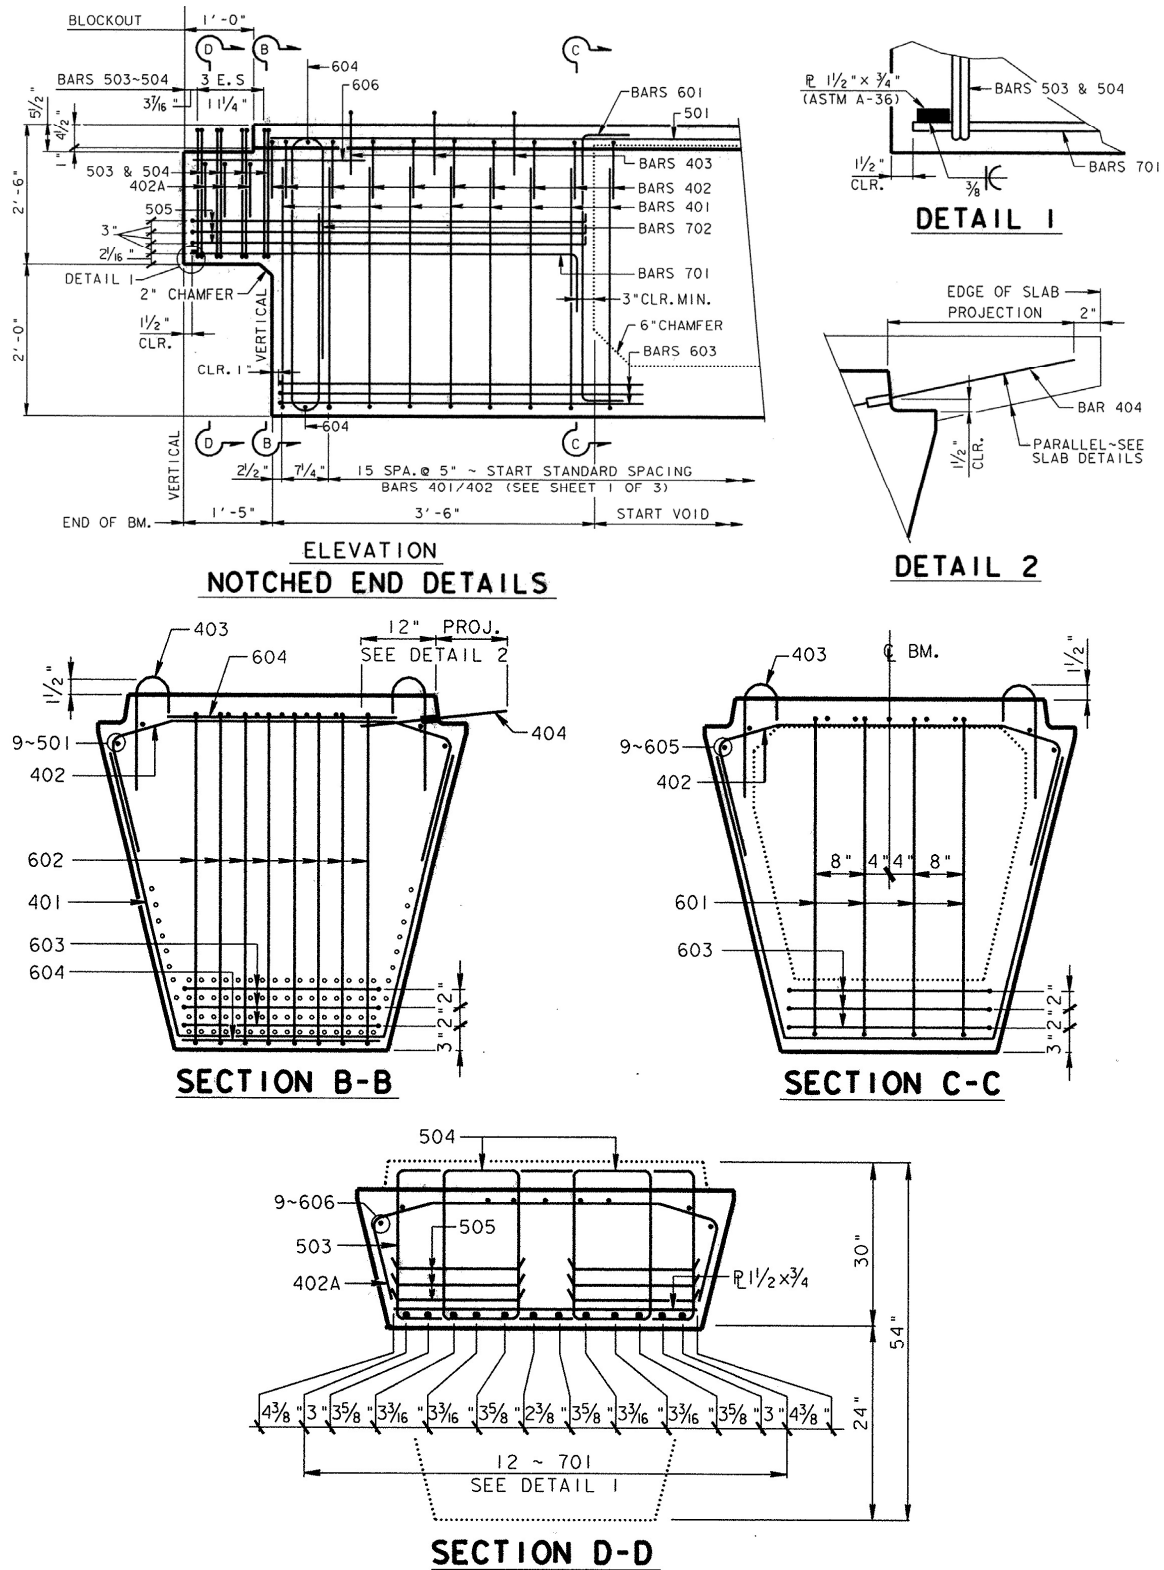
Dapped end reinforcement detail for 54" prestressed trapezoidal box beam.
